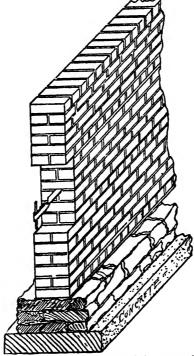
,335.—Eight inch inside wall showing anchor built into recess for tying corner or intersecting wall.
